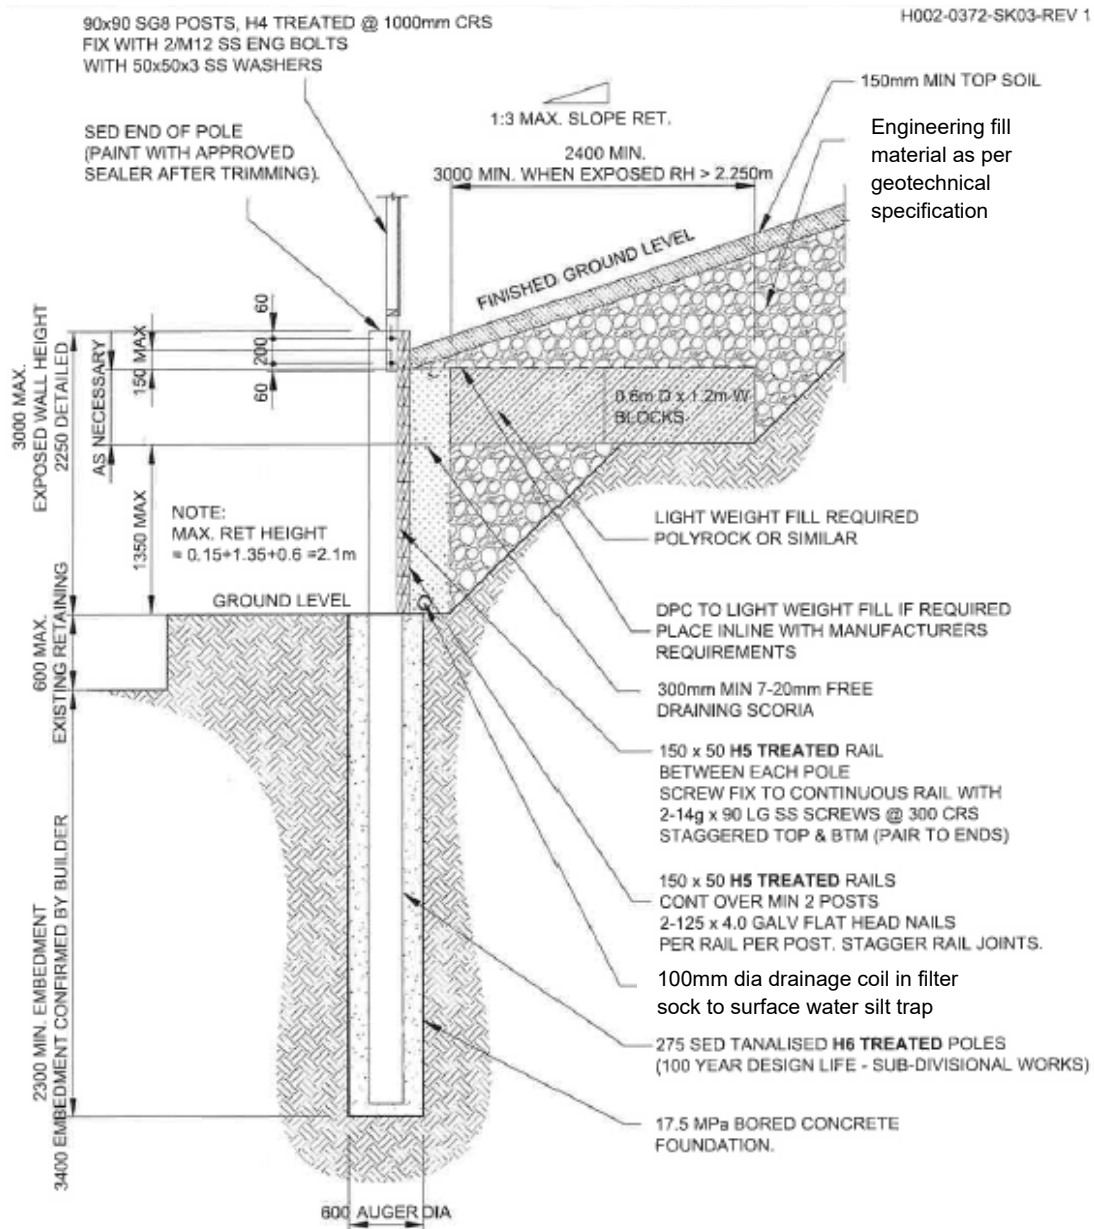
As-built detail for the Type 3 retaining wall.⁴¹
